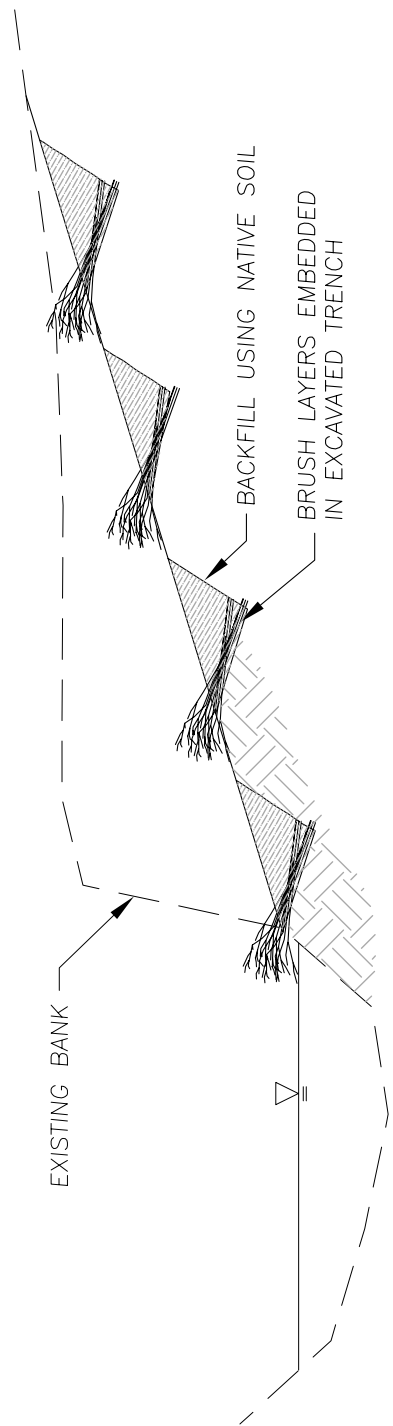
Typical drawing showing brush mattress as bioengineered treatment for bank stabilization.
